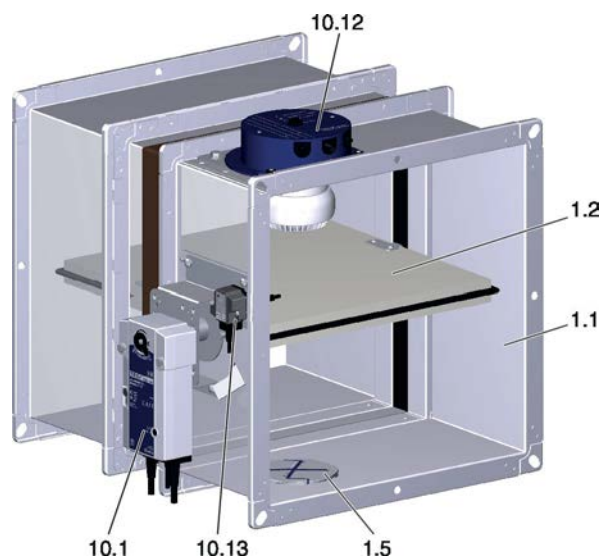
FKA2-EU with spring return actuator and duct smoke detector
